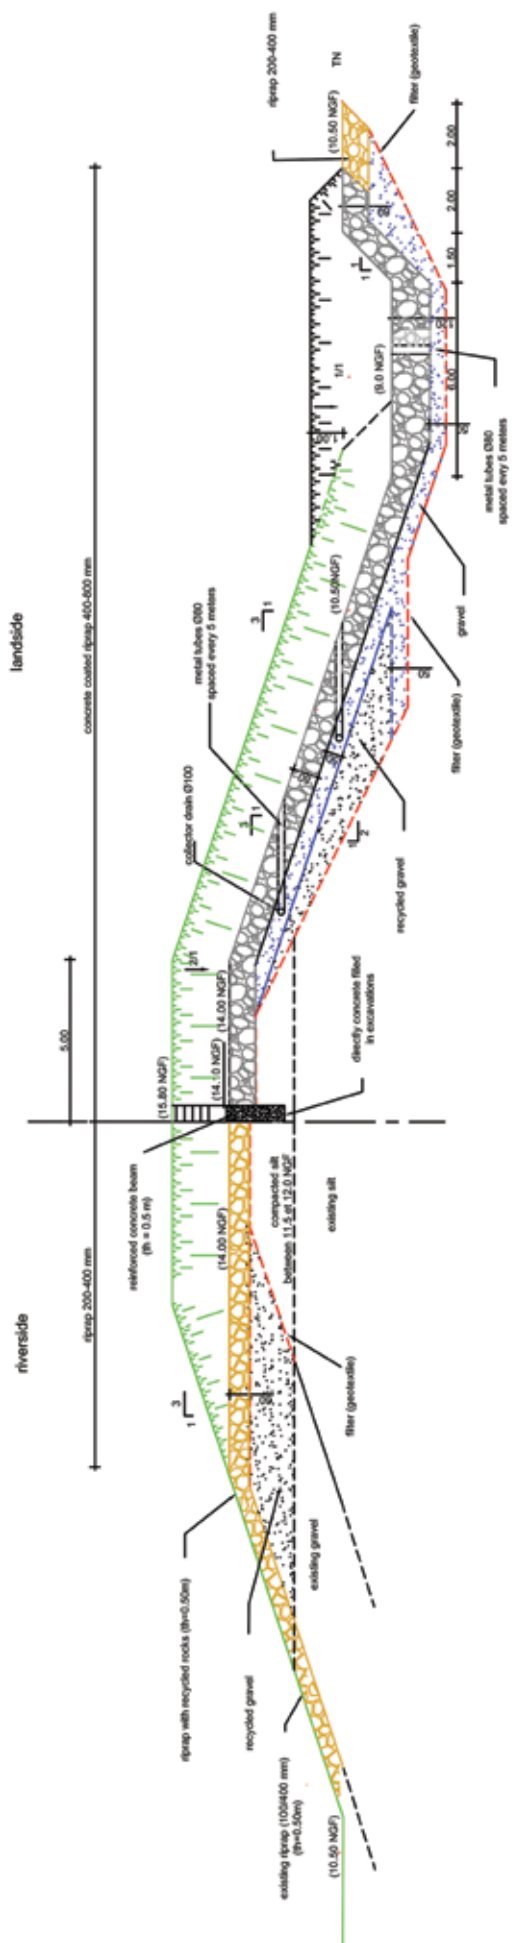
Typical cross-section of the spillway on the left bank of the Rhône at Comps (after Degoutte et al, 2012)
